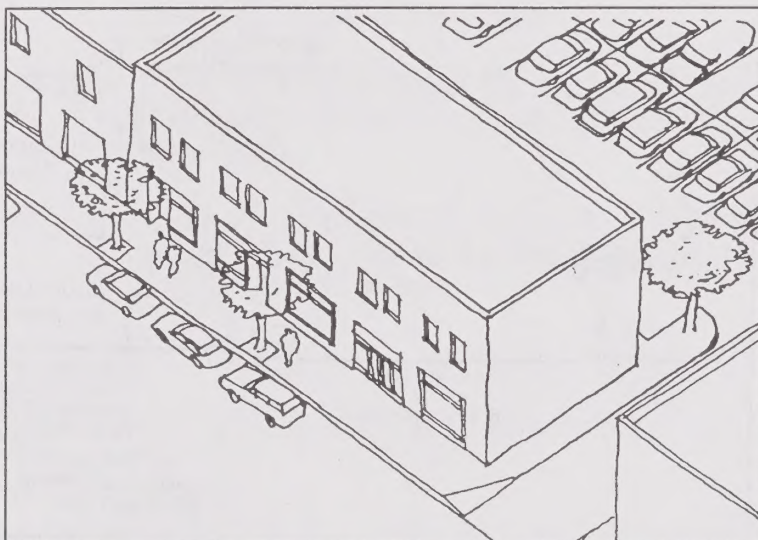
Pedestrian-oriented site details of this development include parking located at the rear of the building, frontage placed at the 5-foot setback line with an consistent street edge, and an expanded front sidewalk in the setback area.
